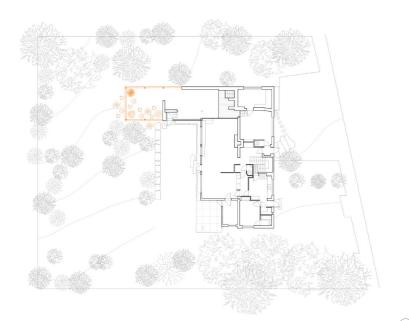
Original plan of Aalto House by Archeyes. Altered by authors.
